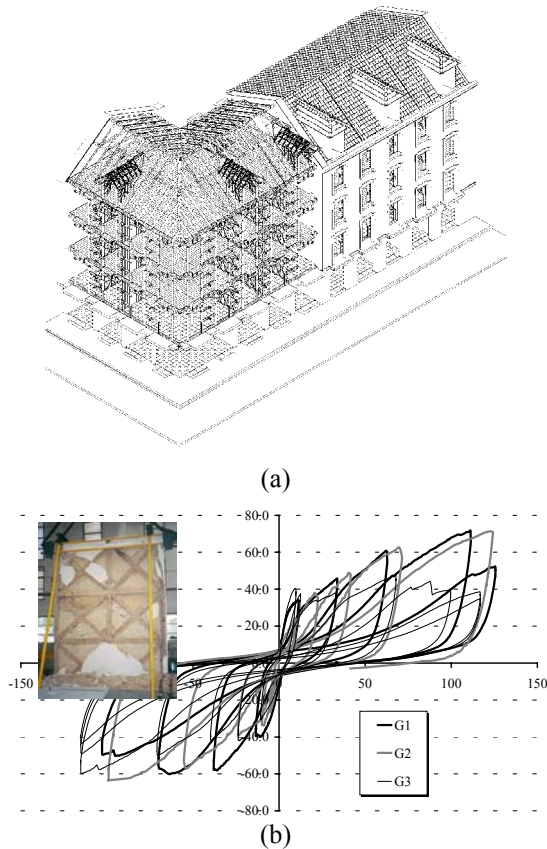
Aspects of Pombaline construction: (a) building with the façade walls removed to show the timber bracing system and (b) mechanical characterization of the internal walls under combined in-plane vertical and horizontal loading.
